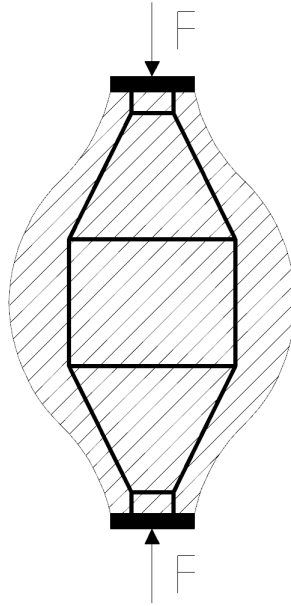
Strut and tie model used to calculate the splitting forces in the concrete under the anchor plate.
